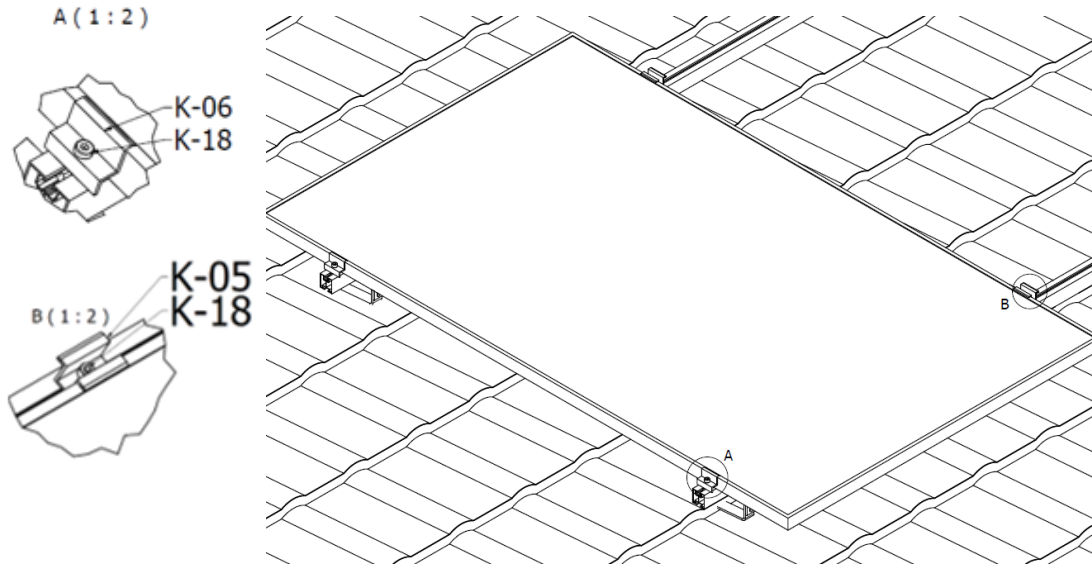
Mounting of the modules and mounting the K-05 and K-06 clamps
